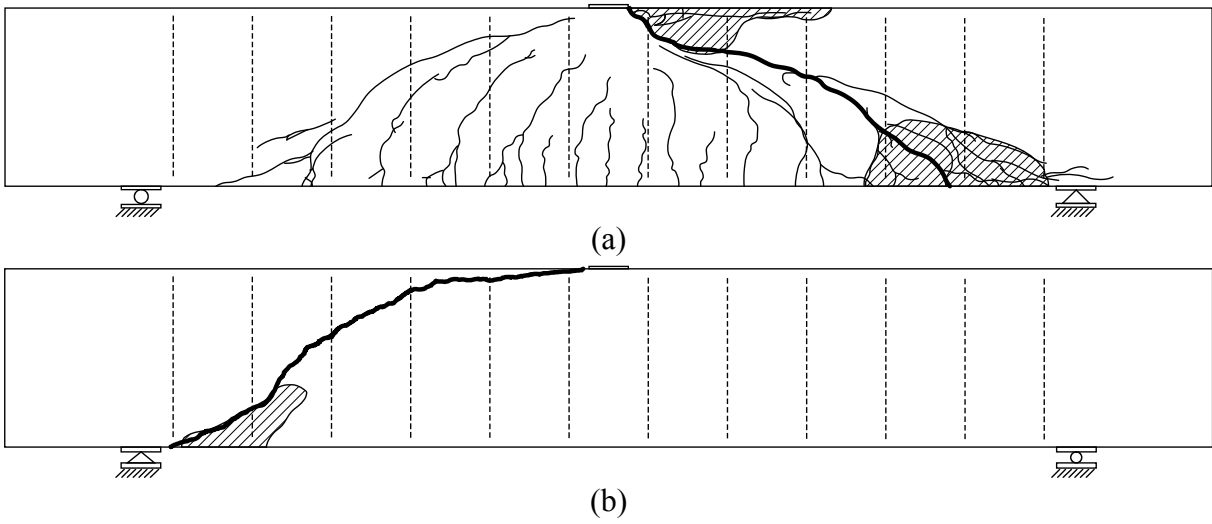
Observed damage in specimen P1S2, (a) front side, (b) back side
